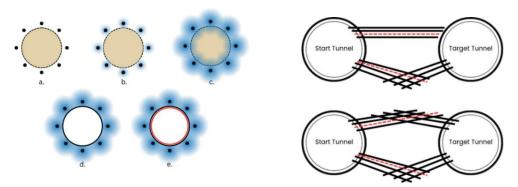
(left) Schematic view of artificial ground freezing stages during cross passage construction. a. Installation of the freeze pipes b. Growing of the columns around the freeze pipes c. Closing of freeze wall d. Excavation of the cross passage and apply primary lining e. Installation of the secondary lining; (right) Possible freeze pipe configurations.
